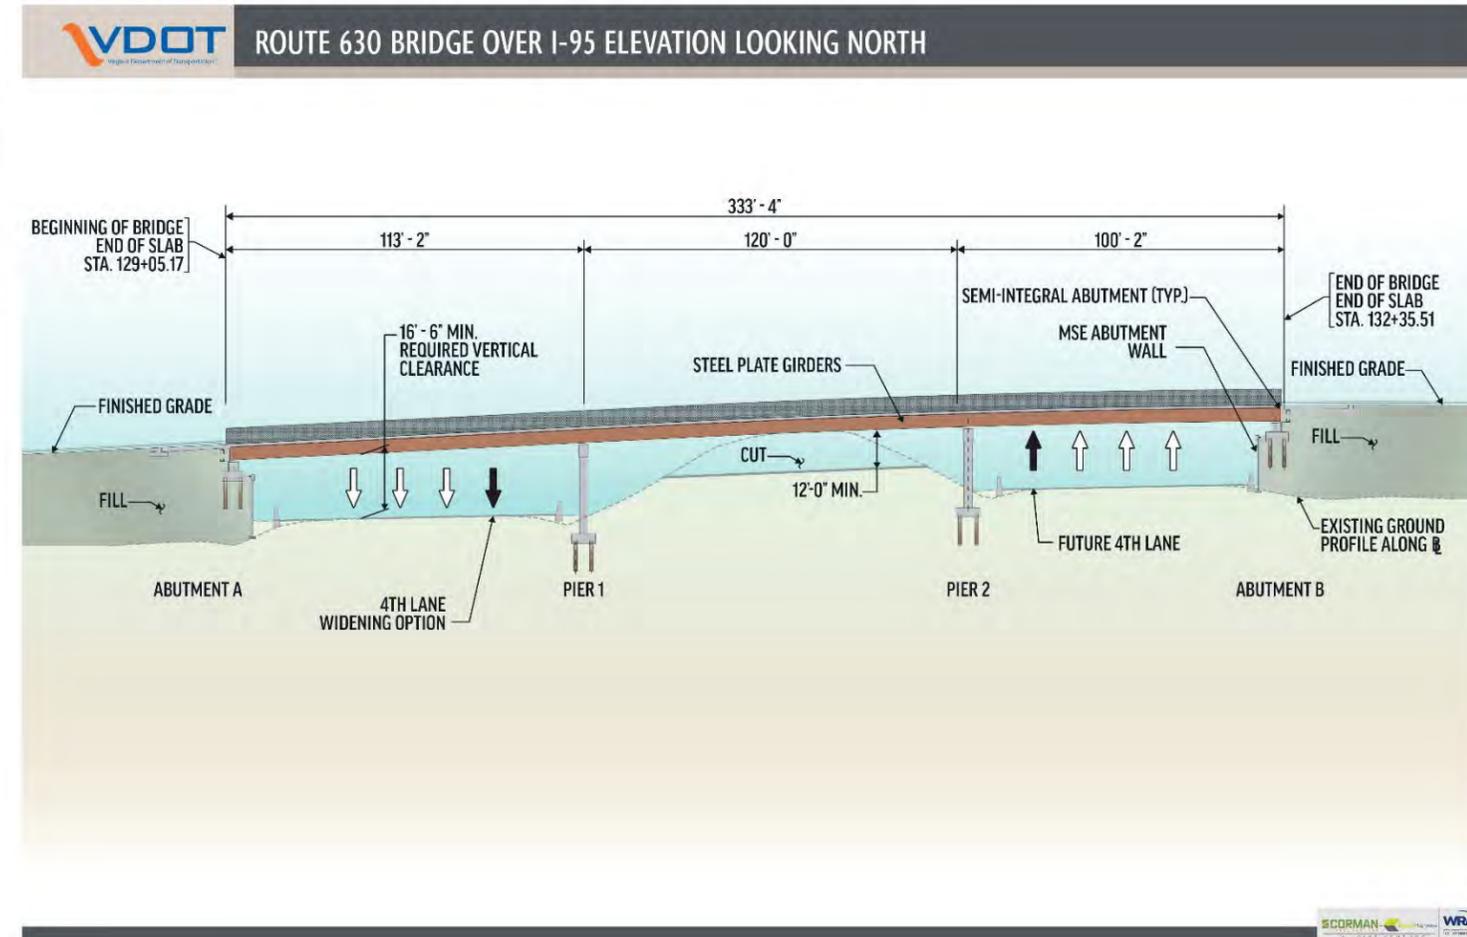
Proposed Elevation View of the Route 630 Bridges over I-95
